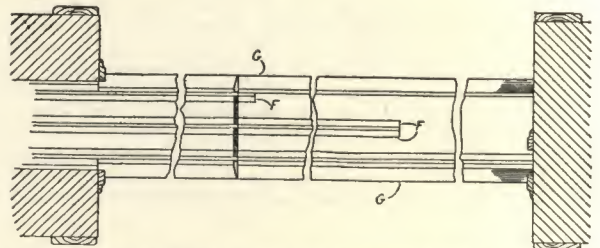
Plan of Floor Guide for steadying the bottom of a Door
